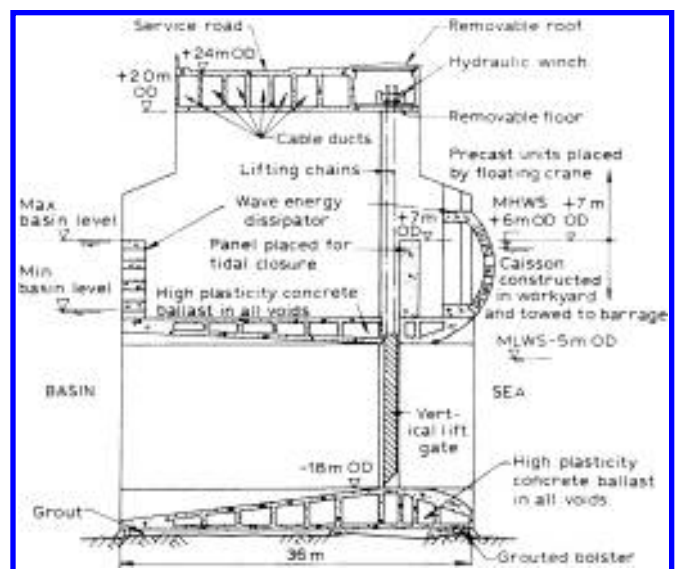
Preliminary design of vertical-lift gate sluice caisson.
